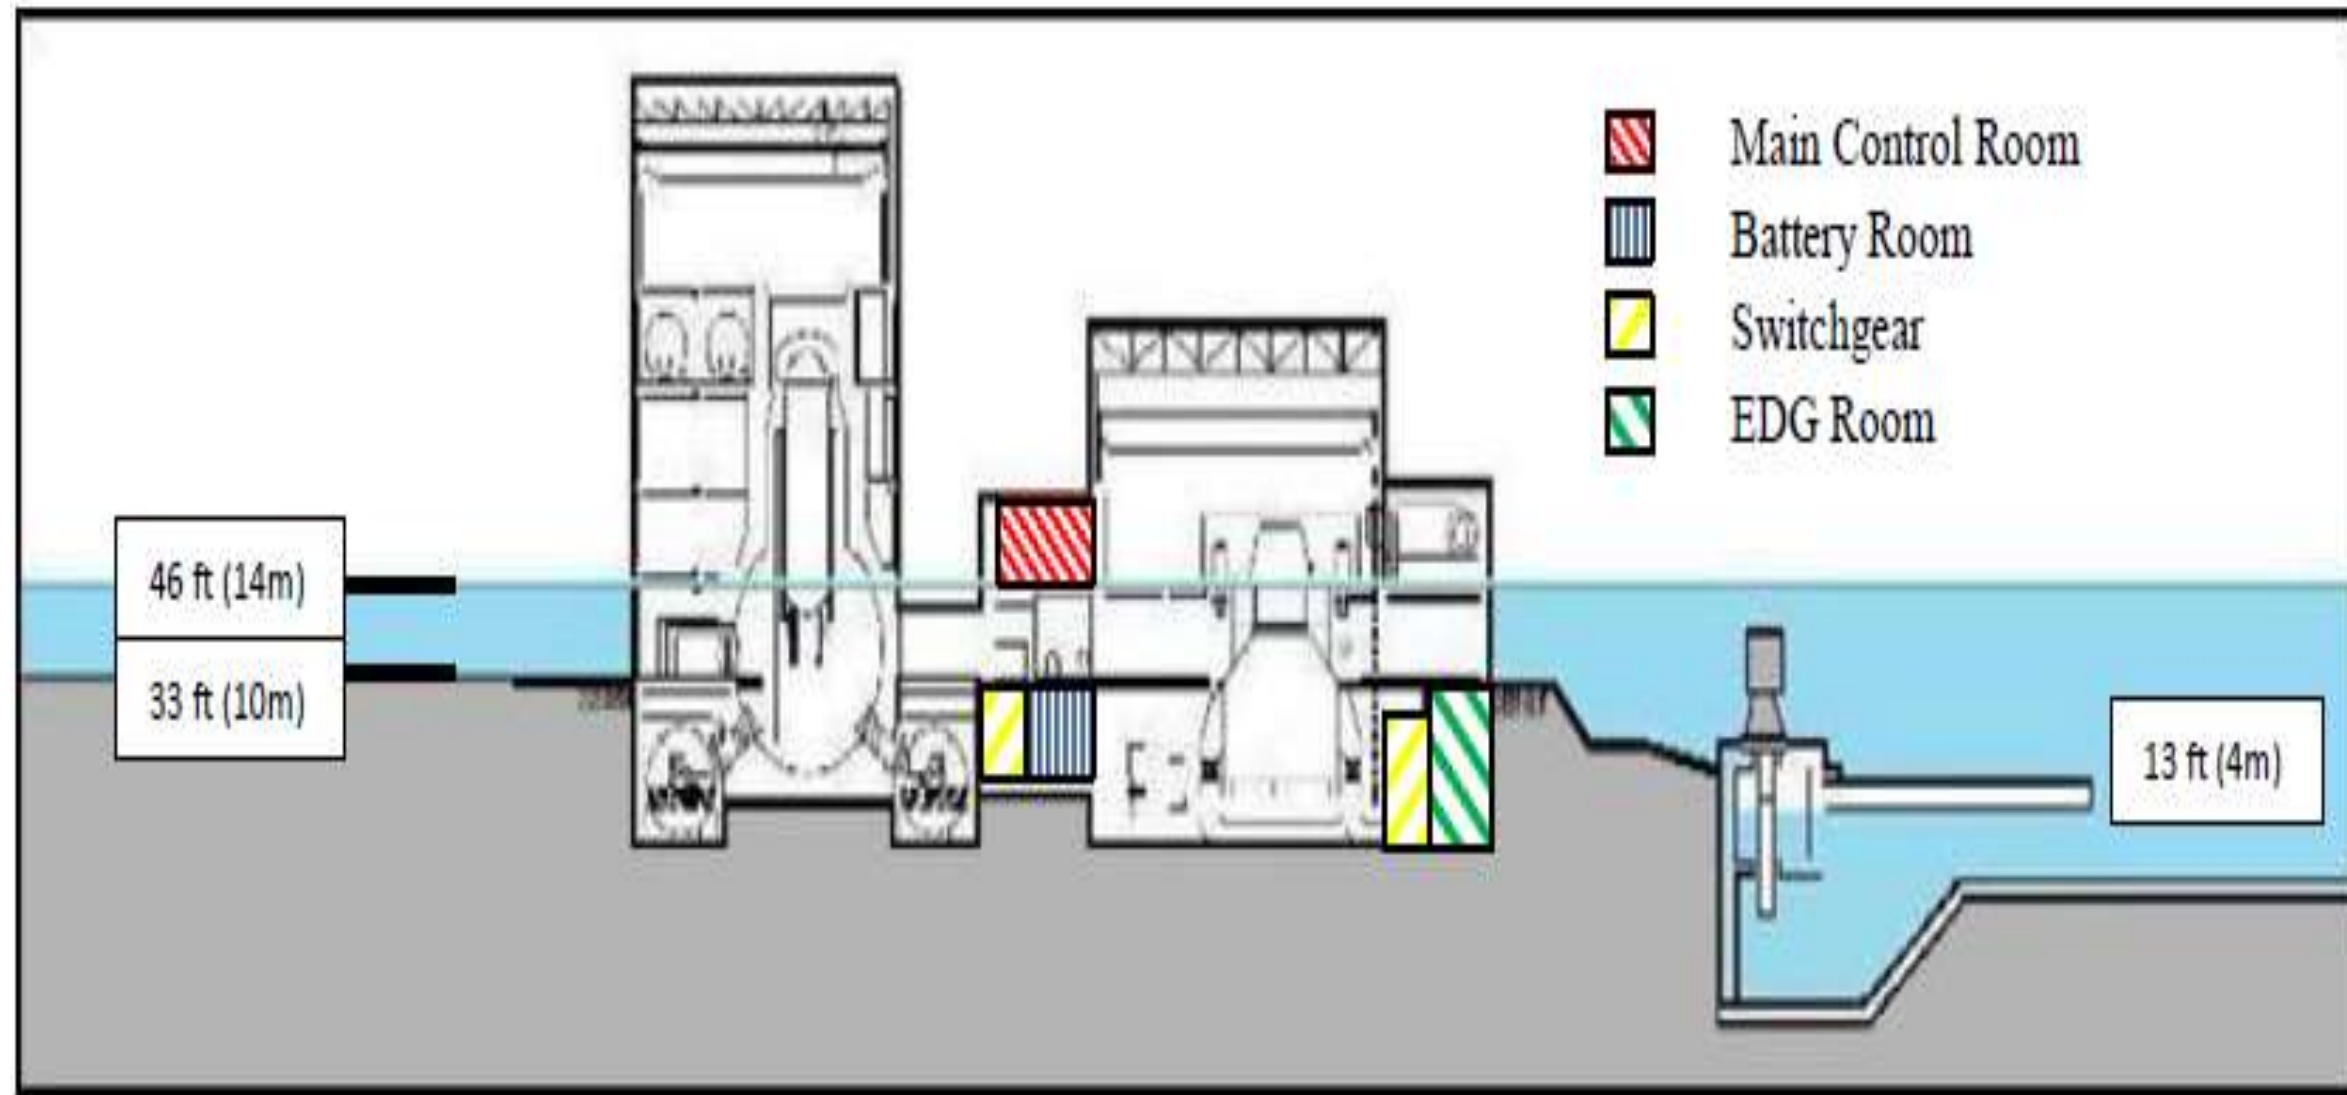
General Elevations and Inundation Level, INPO (2011) ⁽²⁾
